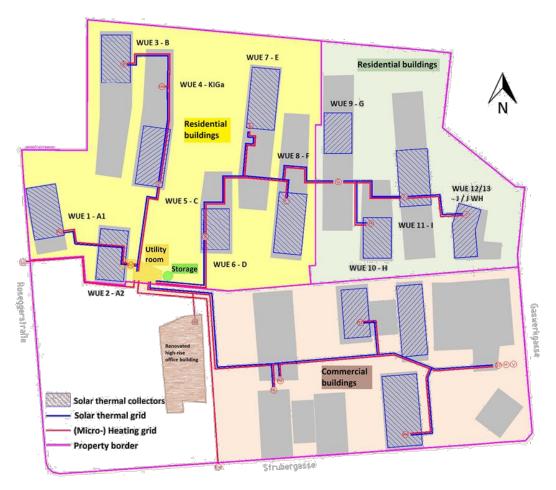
Site plan Stadtwerk Lehen (Source: adapted from EGS-plan). North: new built housing area; South: new built commercial area and renovated high-rise office building.
